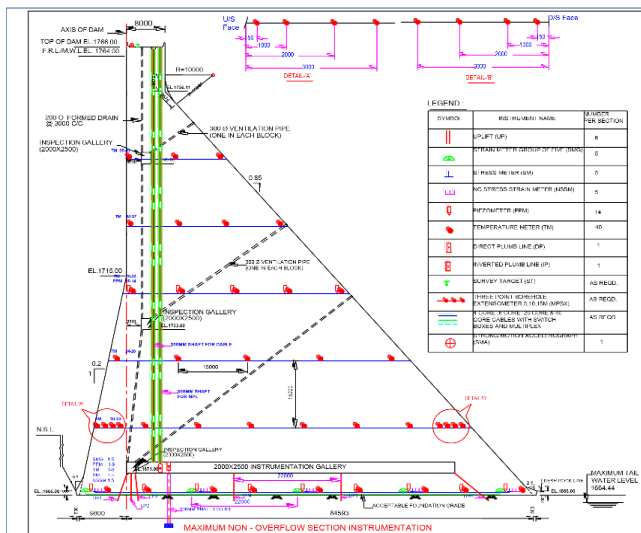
Typical instrumentation layout showing instruments for existing dam
